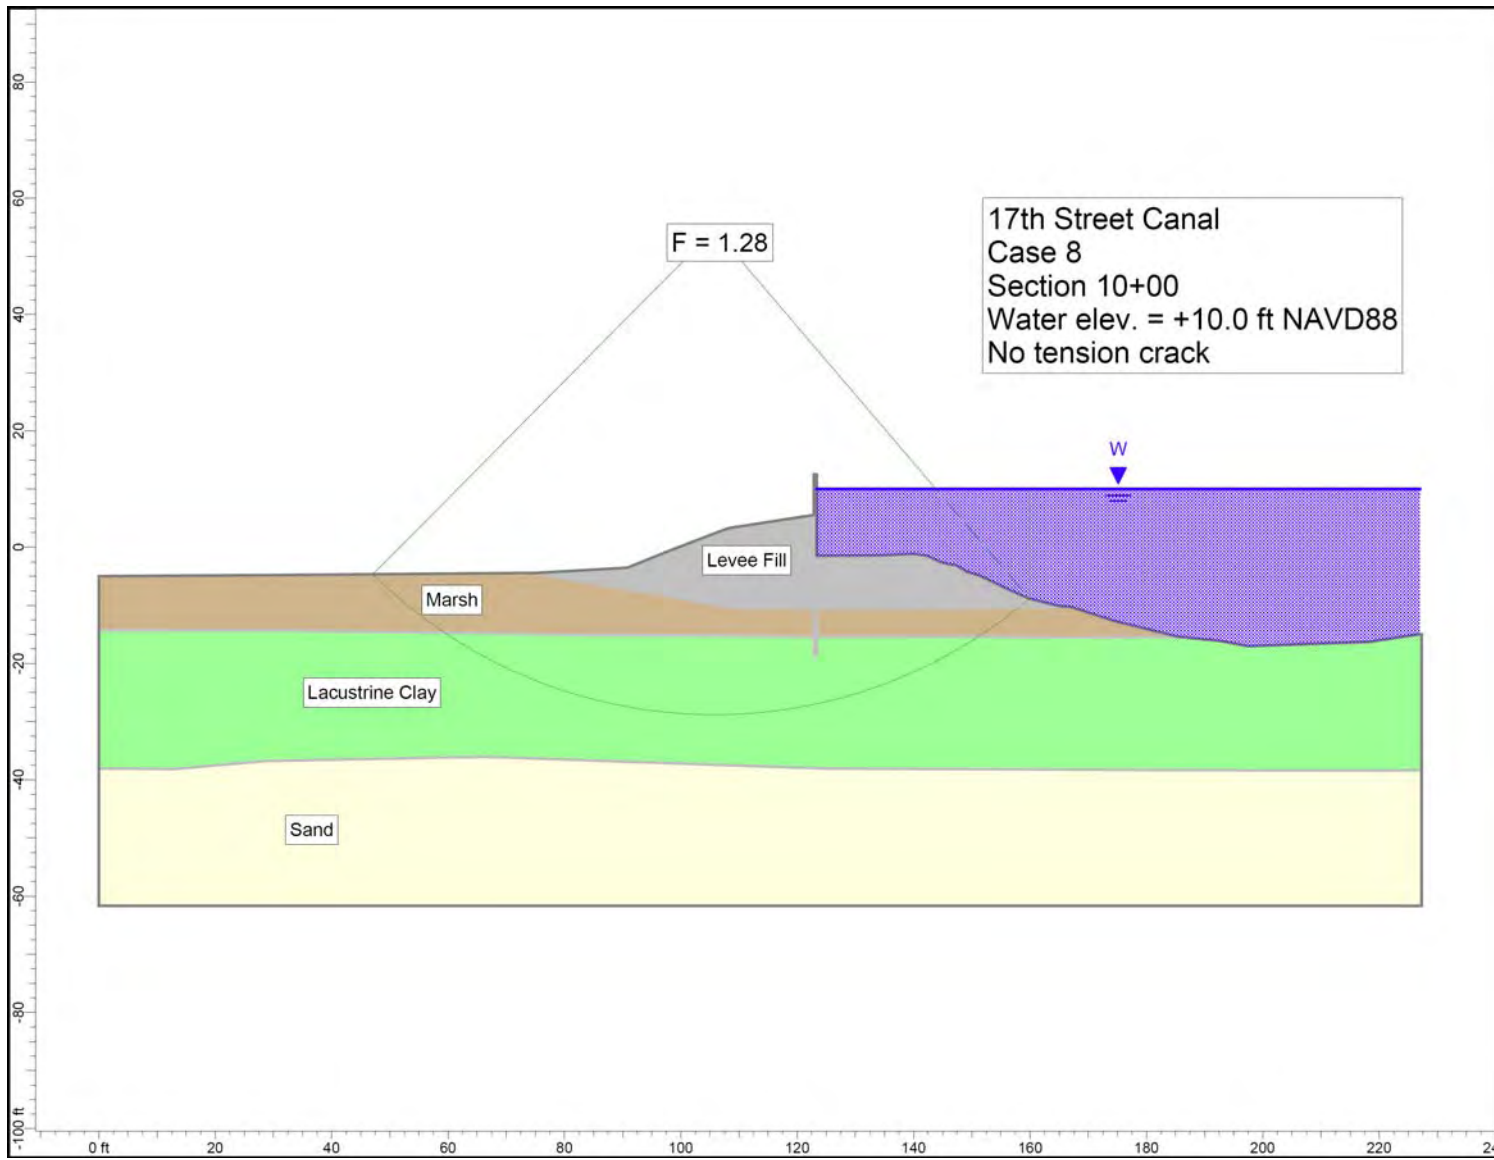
Critical Circle for 17th Street Canal Station 10+00 – Water Elevation 10 ft, No Tension Crack
